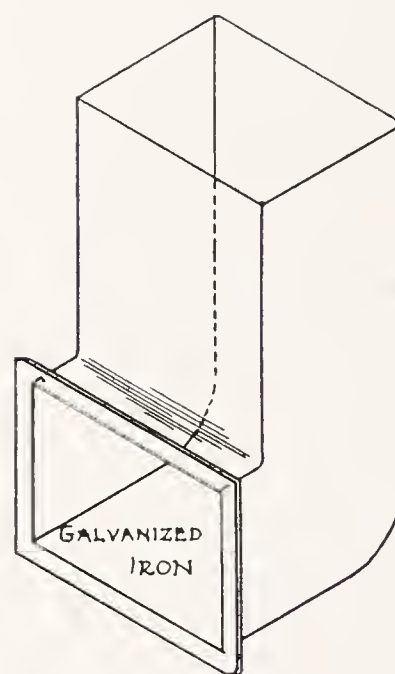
DETAIL OF VENT FLUE ABOVE FLOOR
